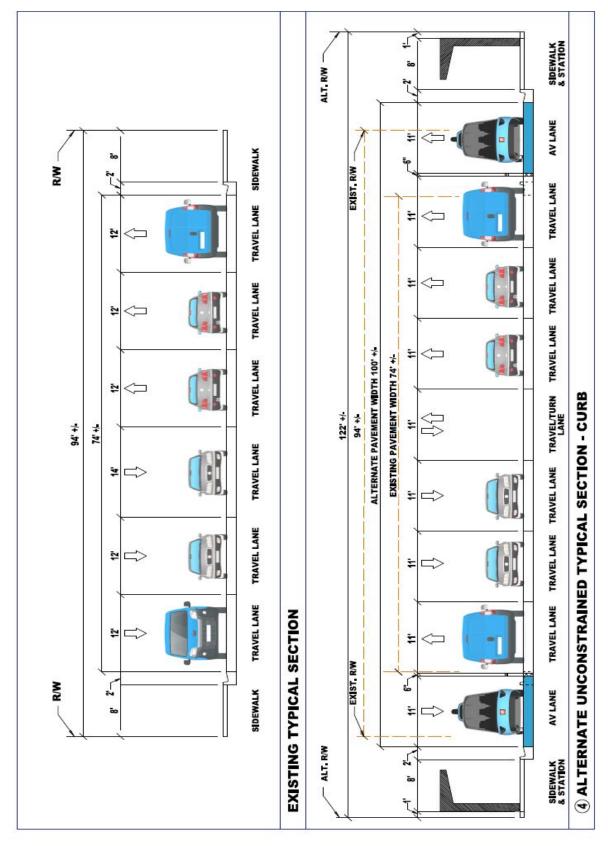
South Corridor Existing and Alternate Unconstrained Typical Section with Curbside Station - San Marco Blvd. North of Prudential Ave.
